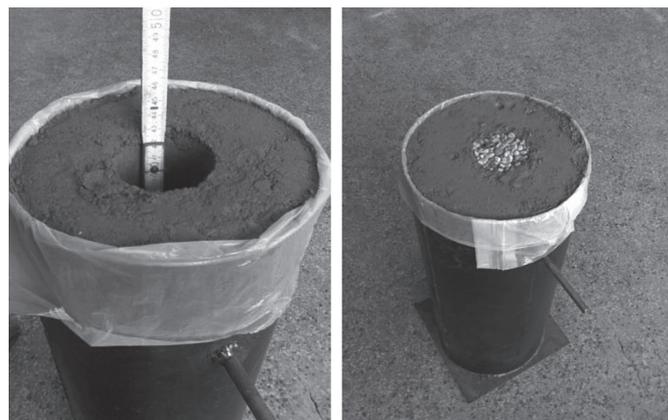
Installing a stone column into the soil and a compacted stone column.
